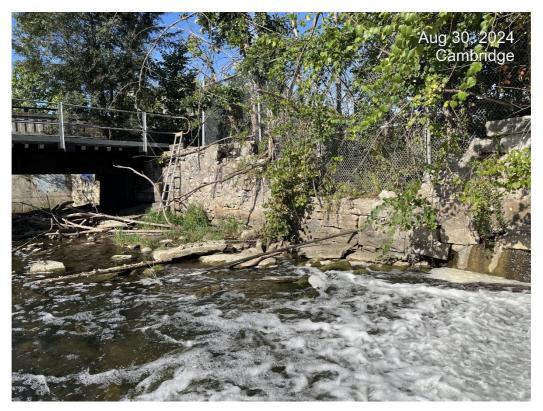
North Retaining Wall immediately Downstream of Spillway
